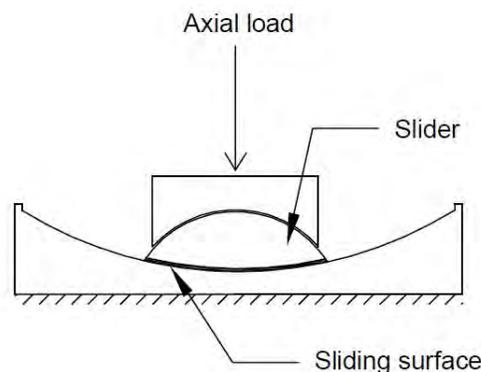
A section through a Friction Pendulum™ (FP) bearing
